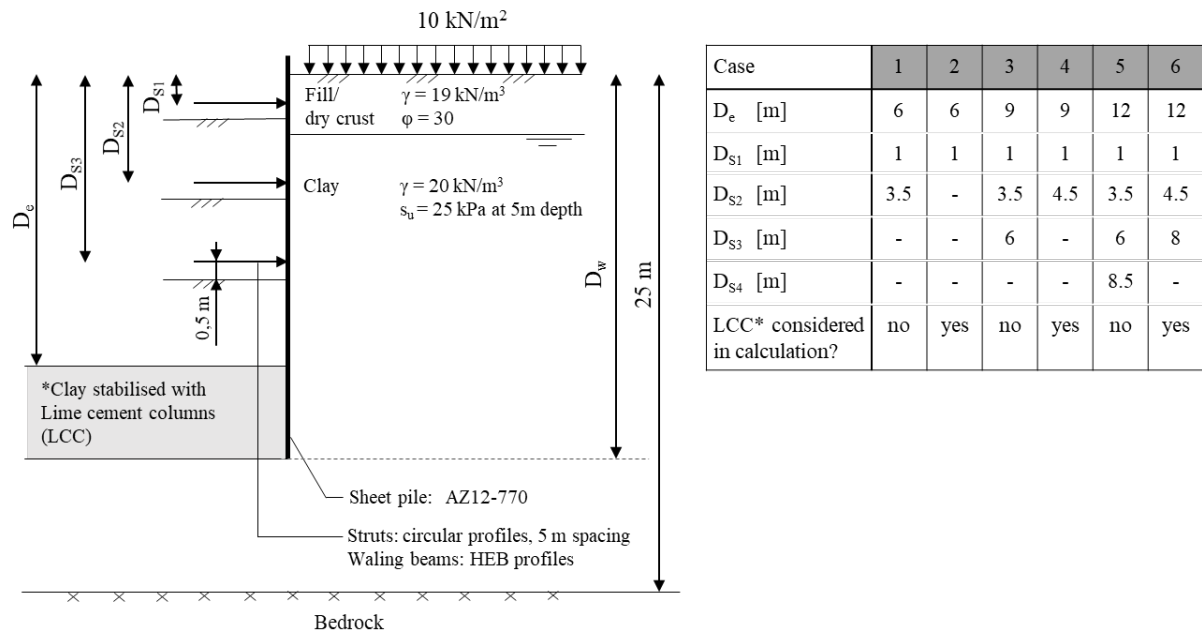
Excavation scenario and list of cases. The excavation depth, D_e , the length of the retaining wall, D_w , and the number and stiffness of struts are varied depending on the case. The soil inside of the sheet pile wall is only stabilised for some of the cases.
